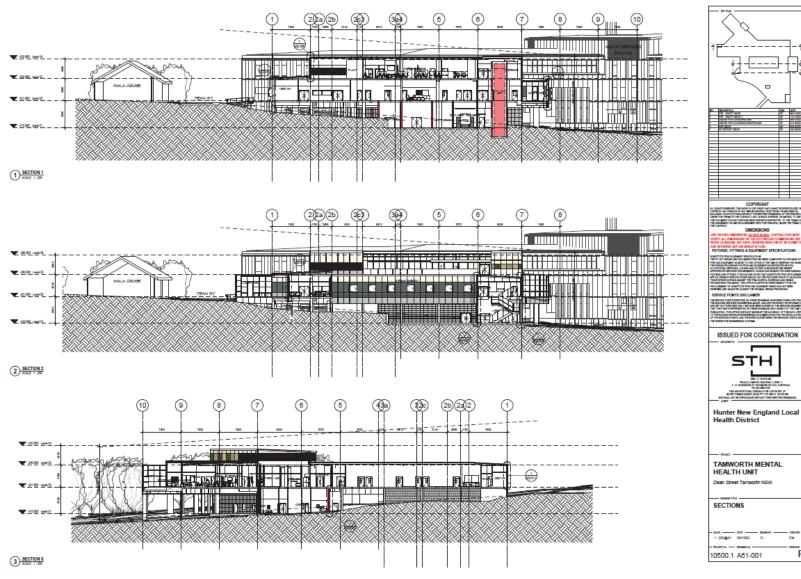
Section plan showing the proposed elevations for the new Banksia Unit building. Source: Silver Thomas Hanley Pty Ltd 2022, A51-001
